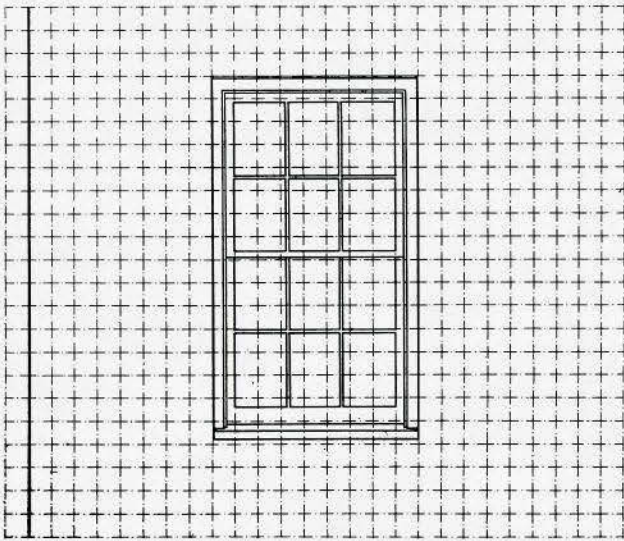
All-purpose, double-hung wood window frame that fits wood or masonry construction.
